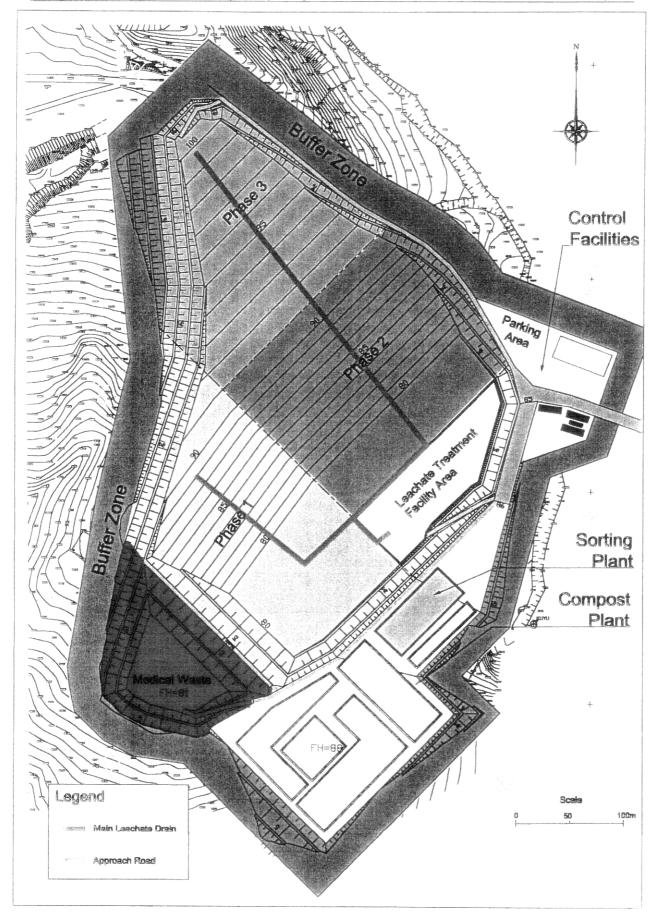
Proposed Medical Waste Disposal Site in Sofulu
